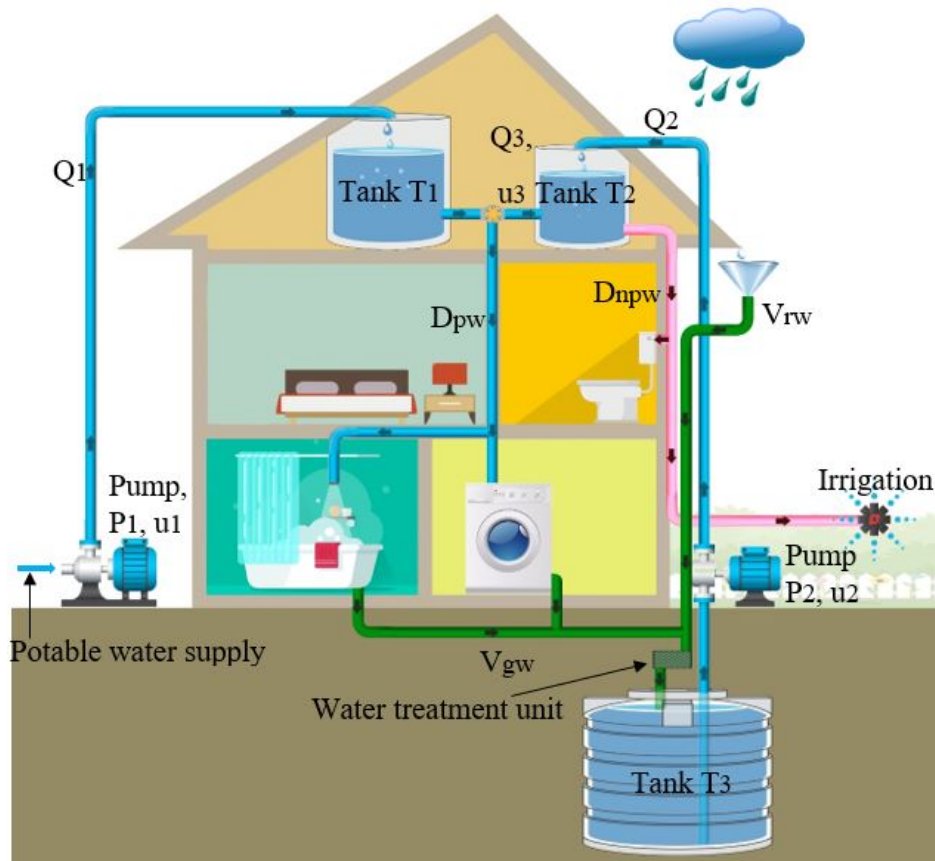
Schematic layout the proposed residential rainwater harvesting and greywater recycling system
